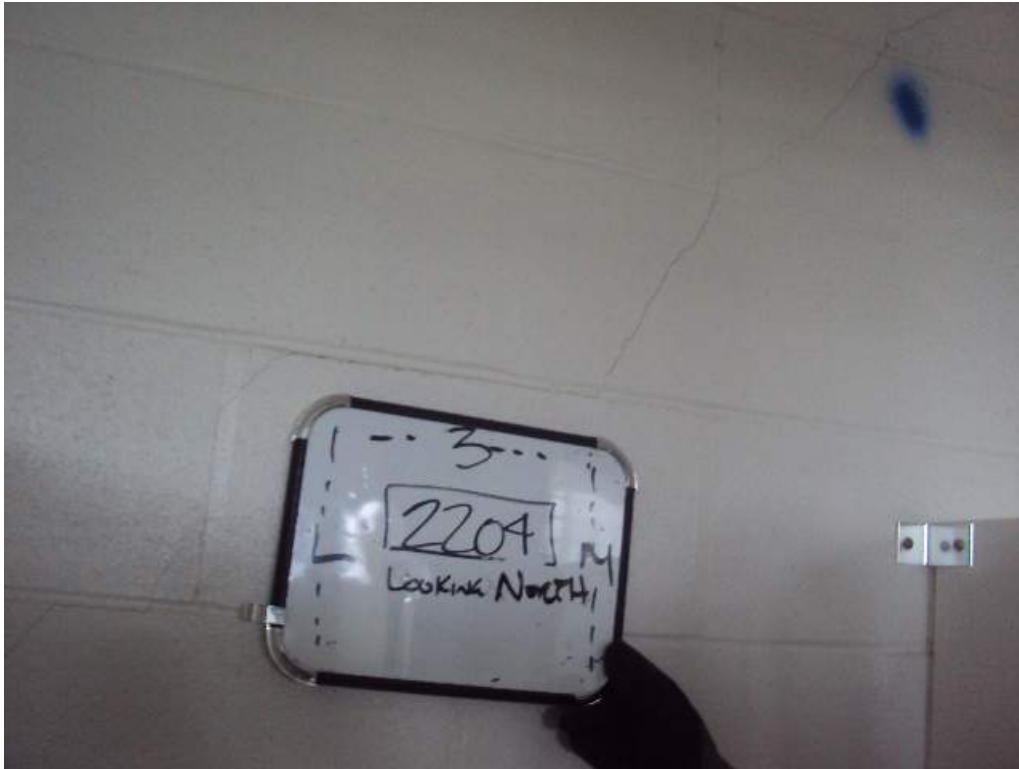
2nd Floor – Room 2204 – Along col line 3 between col lines L and M-Looking North –Stair step crack in CMU wall
